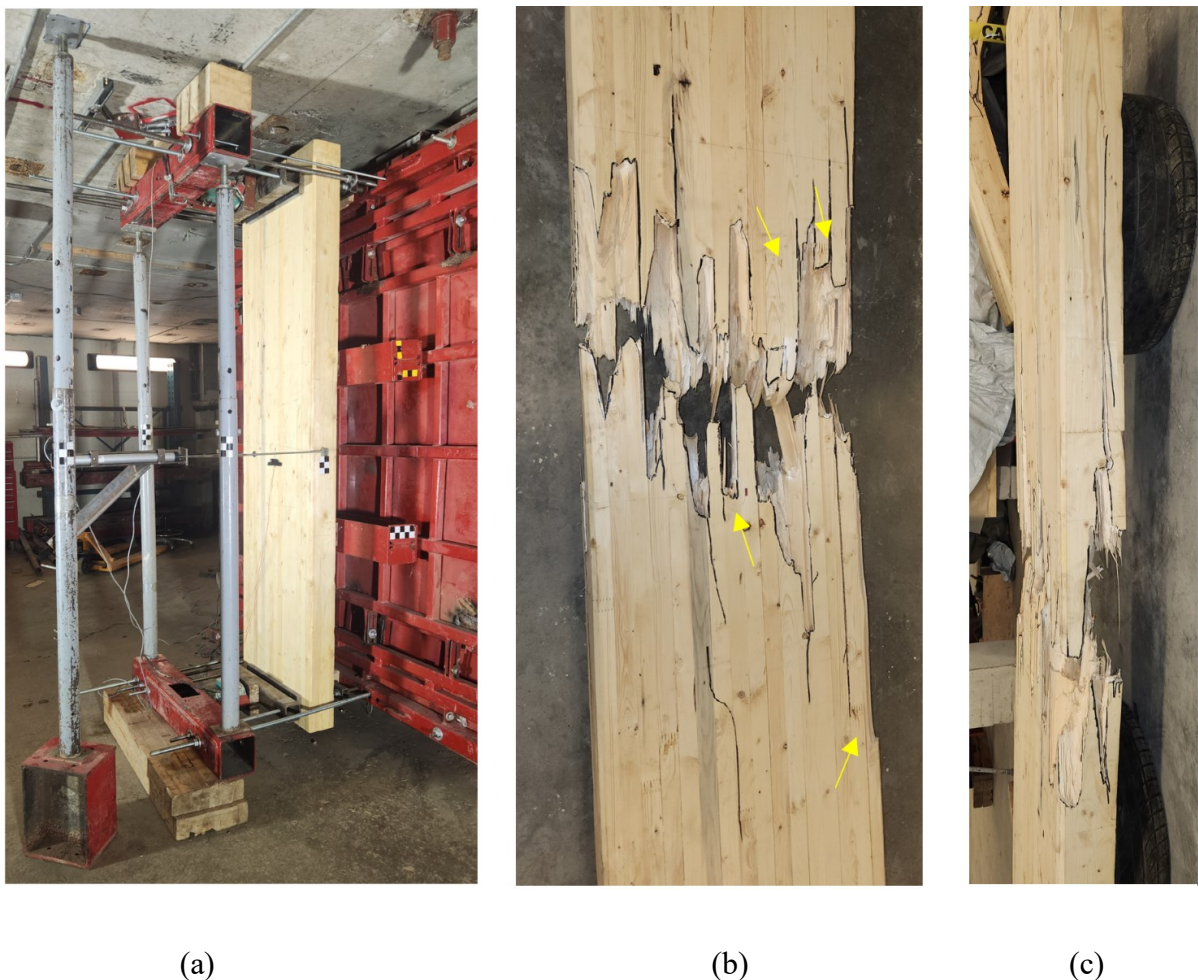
Dynamic Failure of GLT11 [130]: (a) Before test; (b) After test - front view with FJ locations; (c) After test - side view
